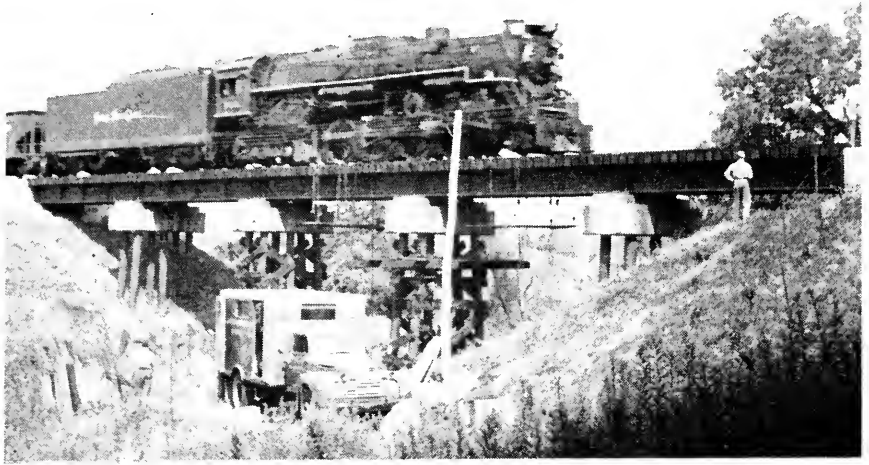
(above)—General view of bridge and test train at Fillmore, Ill. Fig. 2 (below)—View of pier 3, showing type of timber bracing used.
